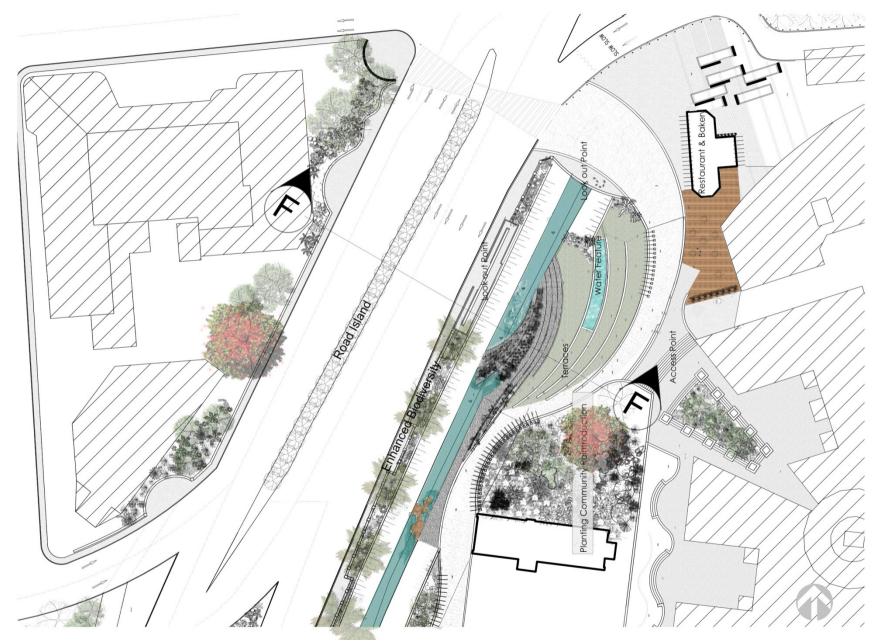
Plan of Scenario 5\_River Widening with Terramesh & River Bed modification with Reno Mattress sunken garden (Author 2014)
